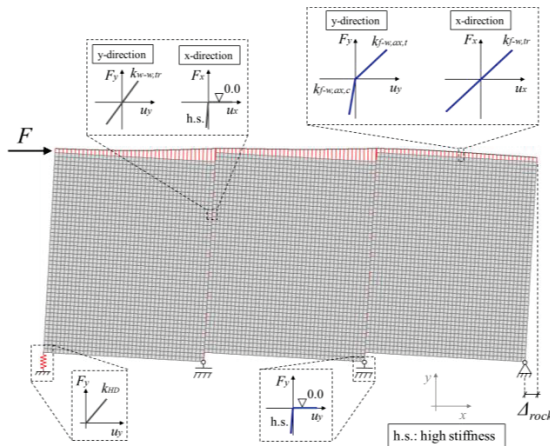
Numerical model of floor-wall interaction (Det-Model).
